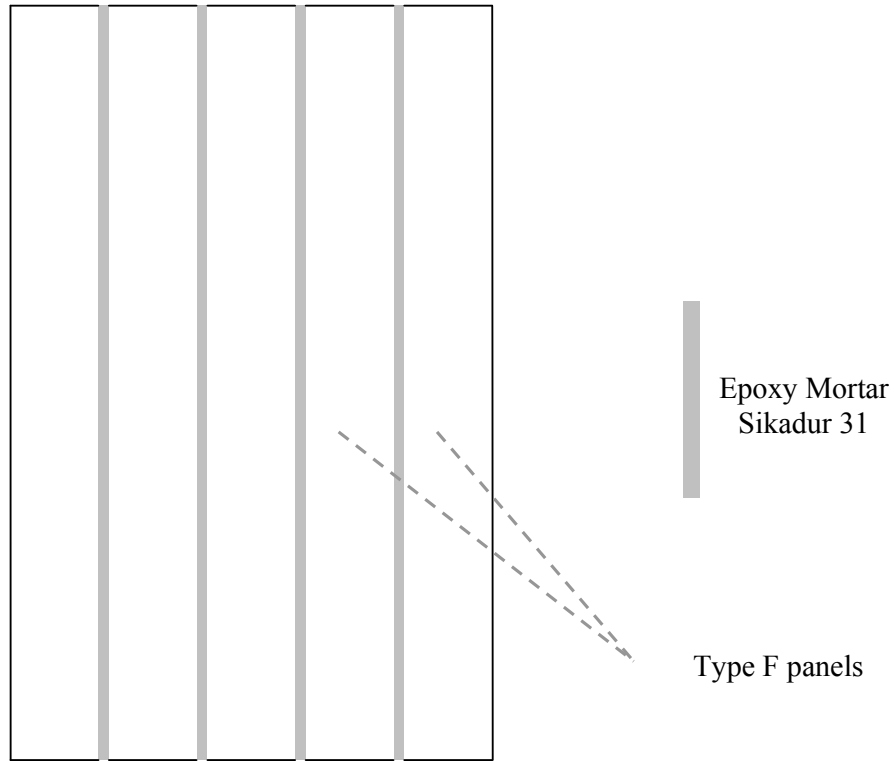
Panel-to-panel connection details, Specimen CEF4
